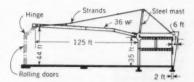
Single cantilever span consists of precast channel slabs supported by structural steel purlins carried by a rolled girder. Girders are supported near the outer end by wire strands tied back over a steel mast to the concrete lean-to framing.
